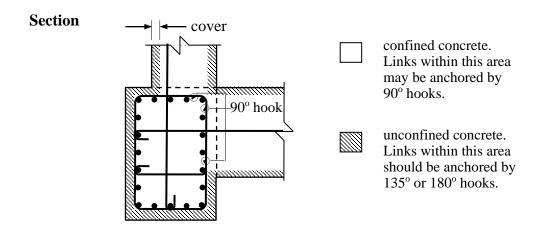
Confined and unconfined concrete regions of a beam-column joint (same as Fig. 2.9)
